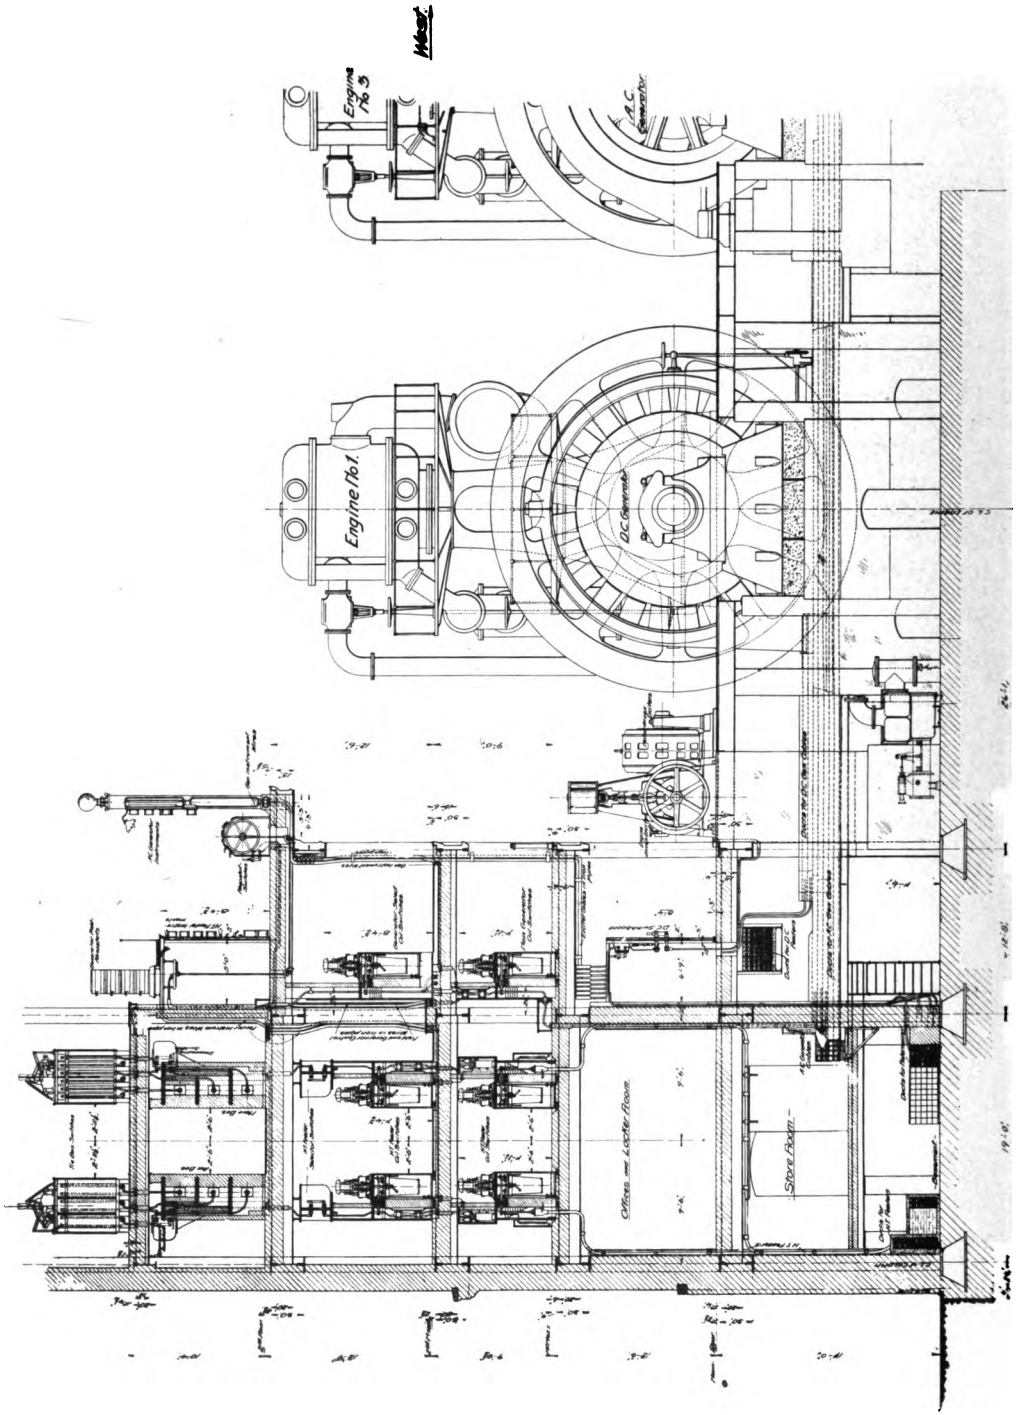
Cross Section through Electrical Galleries, Central Power Station, B. R. T.
